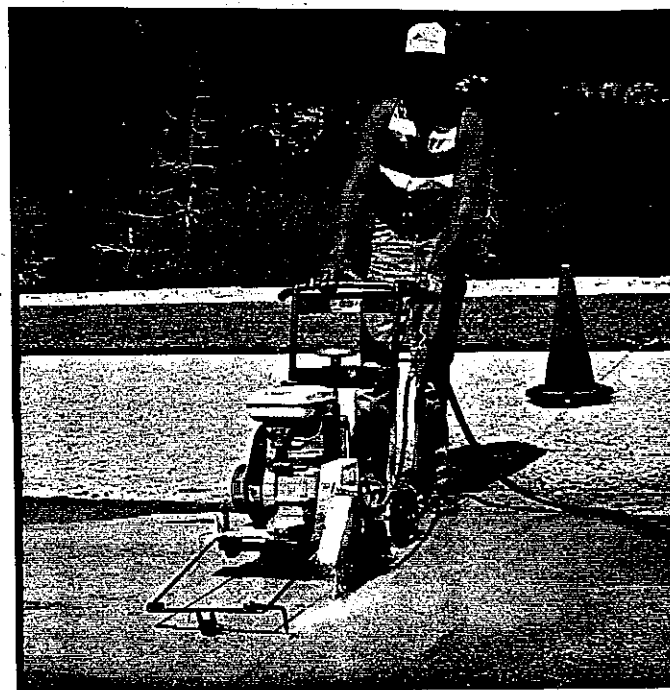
Sawcutting transverse joints in polyester concrete overlay over existing PCC joints.
